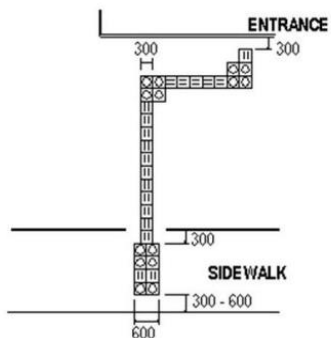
Configuration and layout of tactile pavers: guiding and warning
